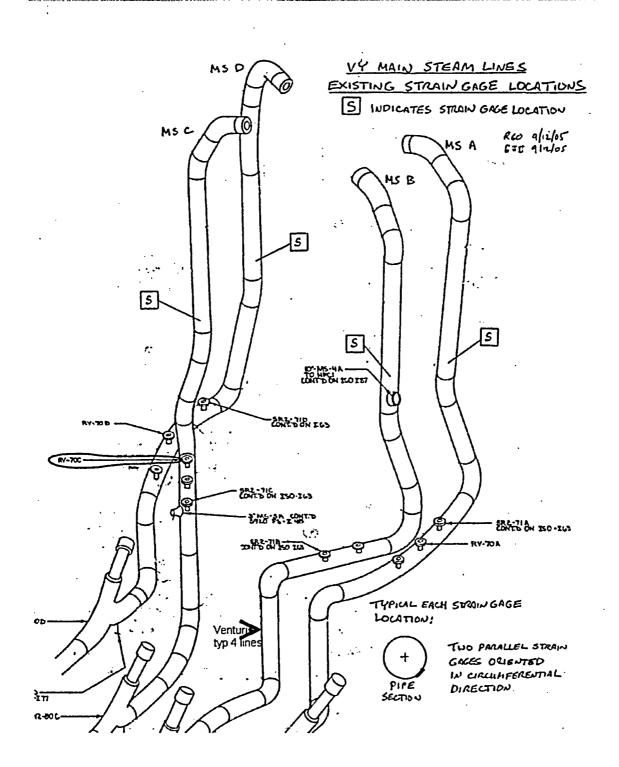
Sheet 3: VYNPS Main Steam Piping Cavities and ACM Measurement Locations
